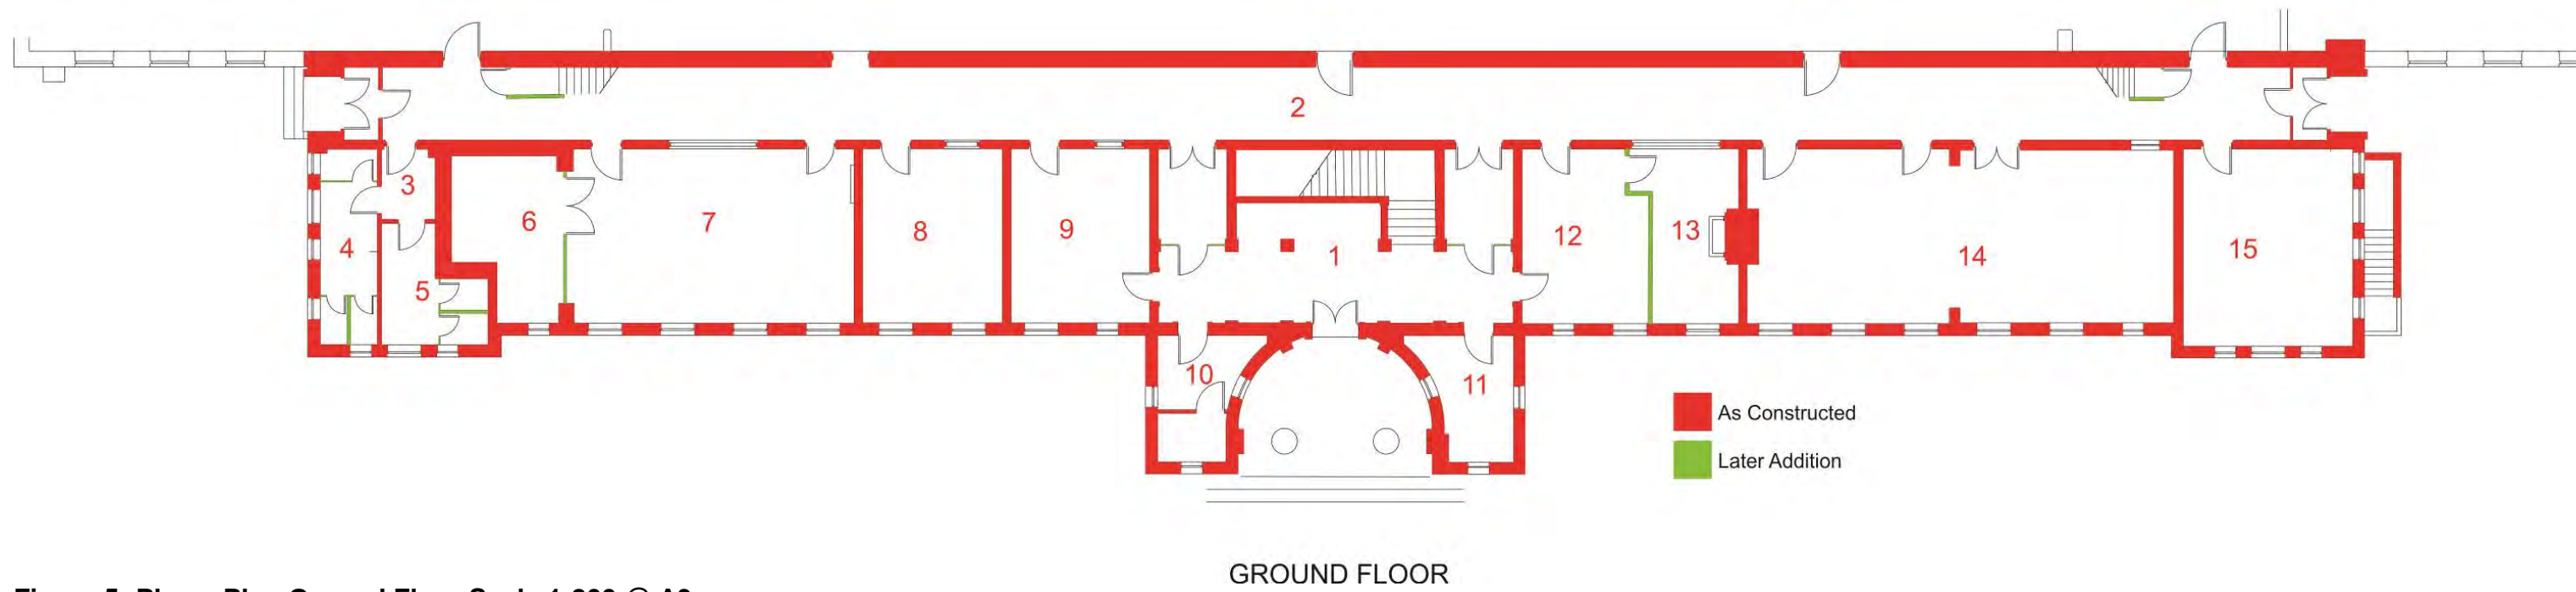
Phase Plan Ground Floor Scale 1:200 @ A3
